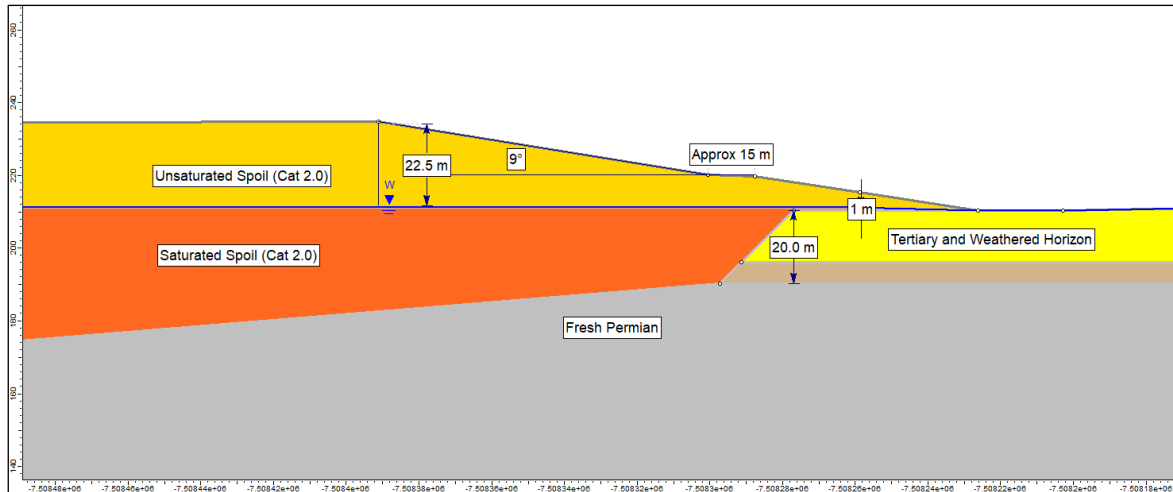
Southern In-Pit Spoil Dump - Section 4 (Southeast Facing)
